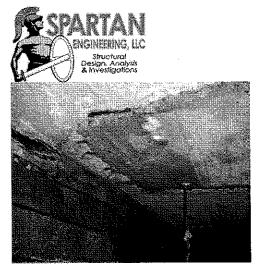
Bottom Surface of Underside of Sheet Piling Forming Roof
